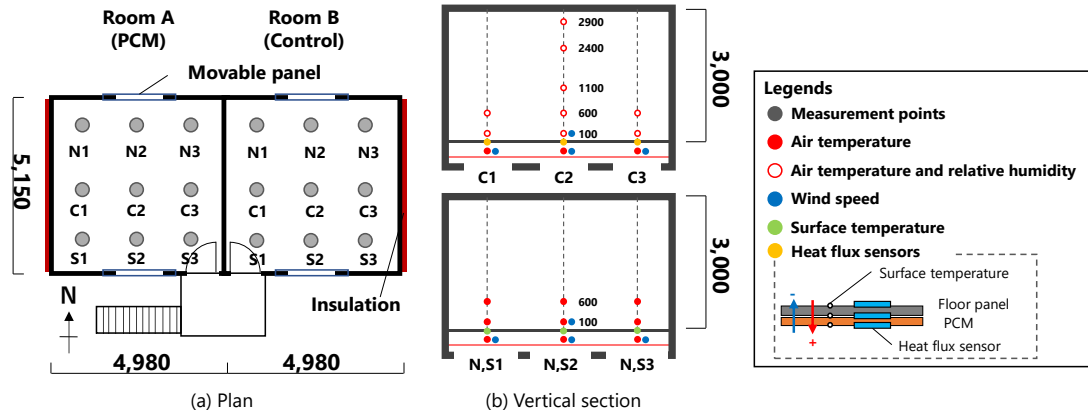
Layout of experimental units and sensor/measurement setting in (a) Plan and (b) Section.
